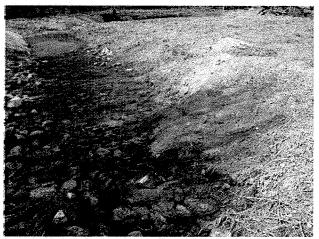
Looking downstream from LT Station 4+00. (9/27/04)
